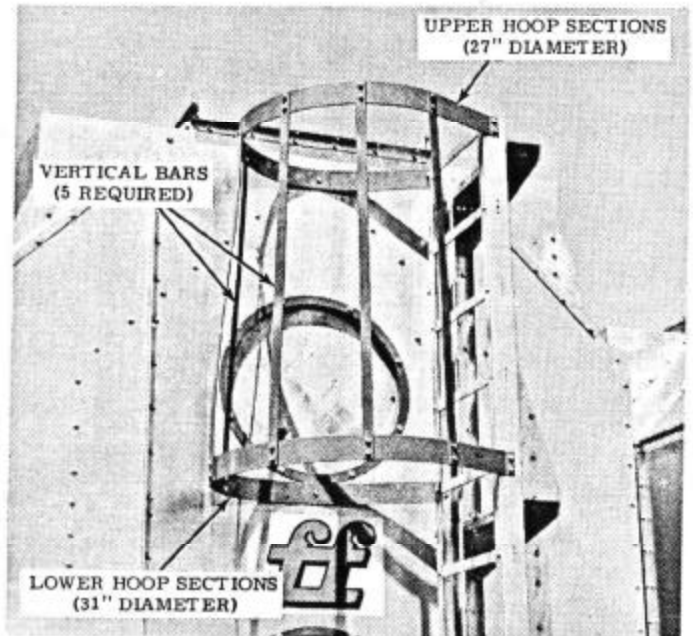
REAR SAFETY CAGE - BOTTOM MODULES
